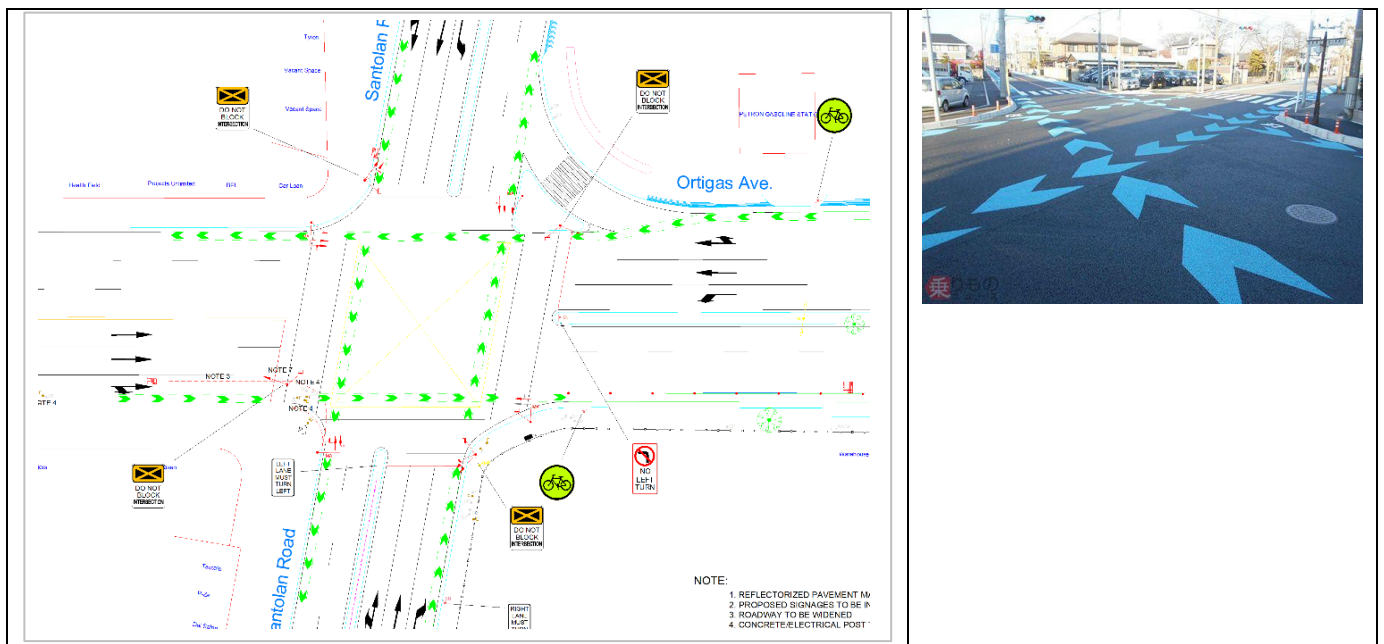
Proposed Cross-section Layout with Bike Lane
